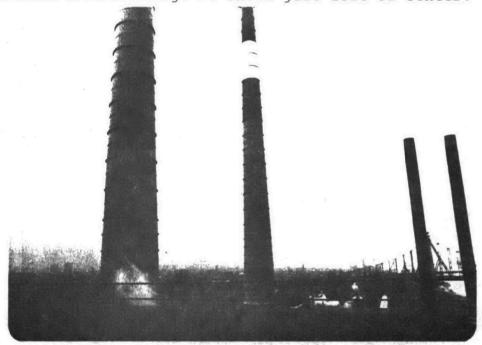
View from the roof of Boiler 30 looking south-southeast. Stacks 10 and 20 are shown in the center of the photo from right to left, respectively.
